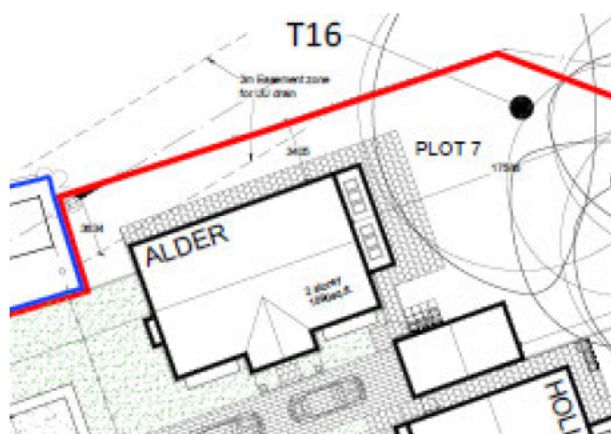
Proposed Layout of Plot 7 (Source: Proposed Site Layout Drawing Ref. CL_01 Rev. N)
